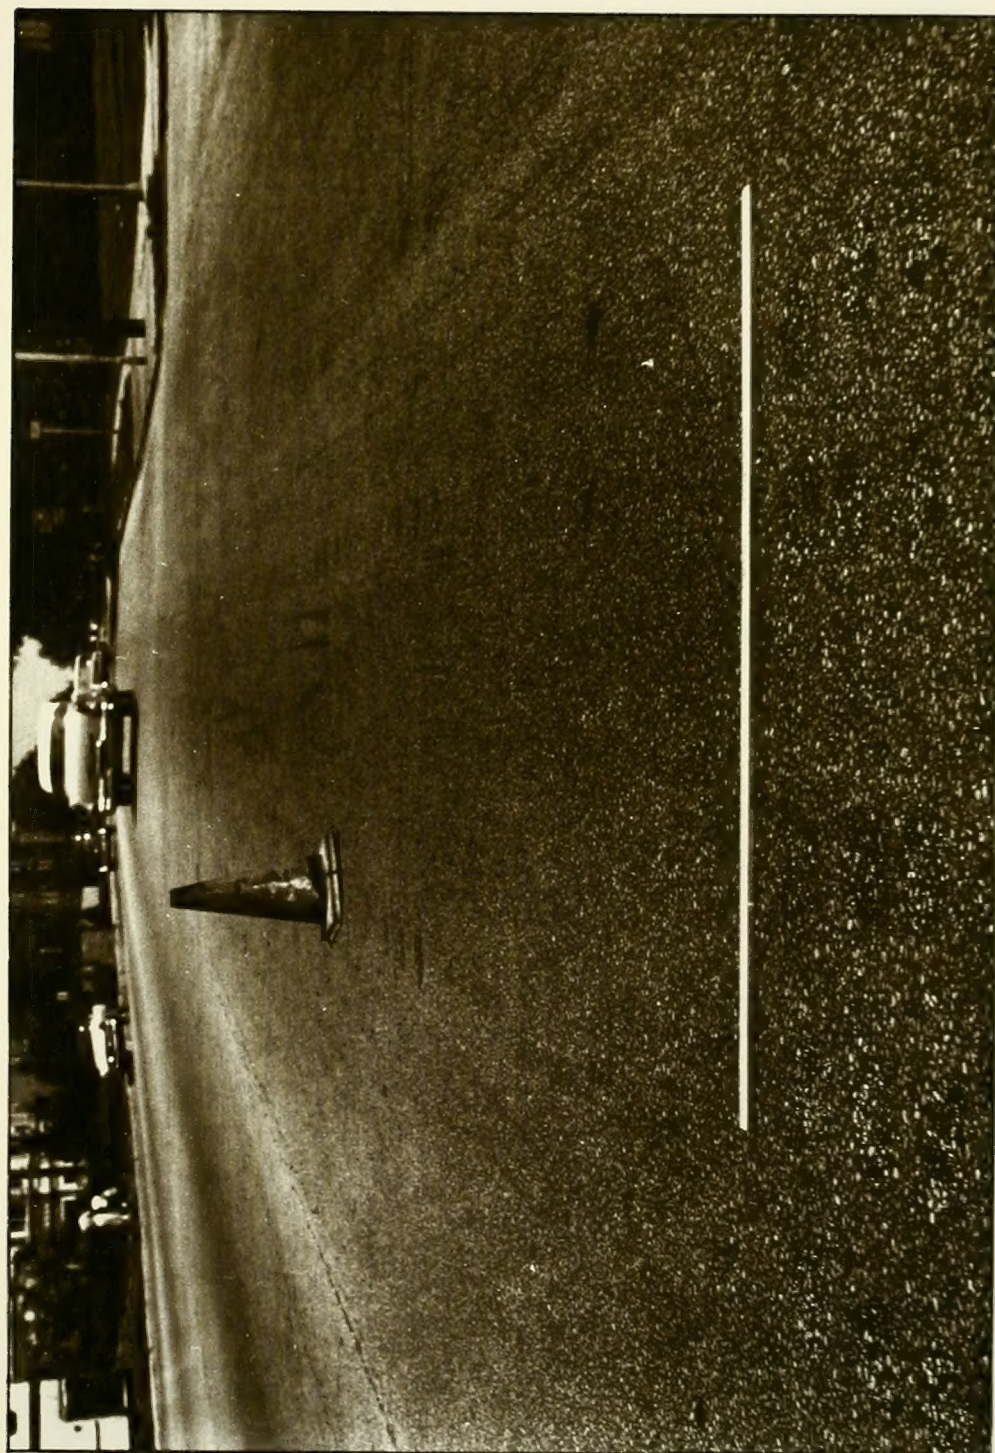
PAVEMENT CONDITION IN TRAFFIC LANE AT INTER-
